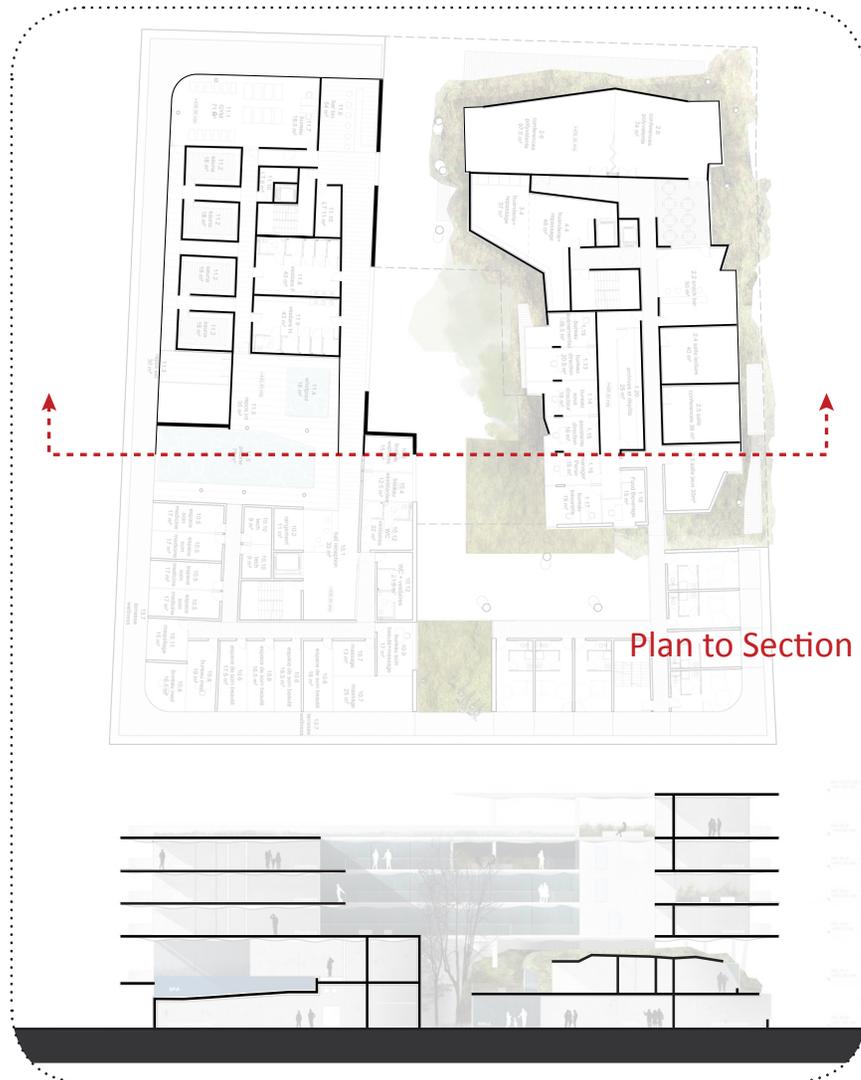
Plan to Section-Stavia. Retrieved from: www.archdaily.com
